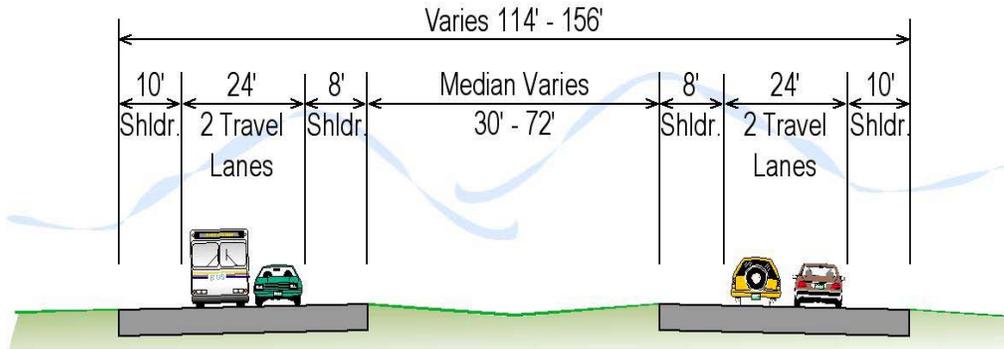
No-Action Alternative Typical I-25 Cross Section - SH 66 to SH 7
